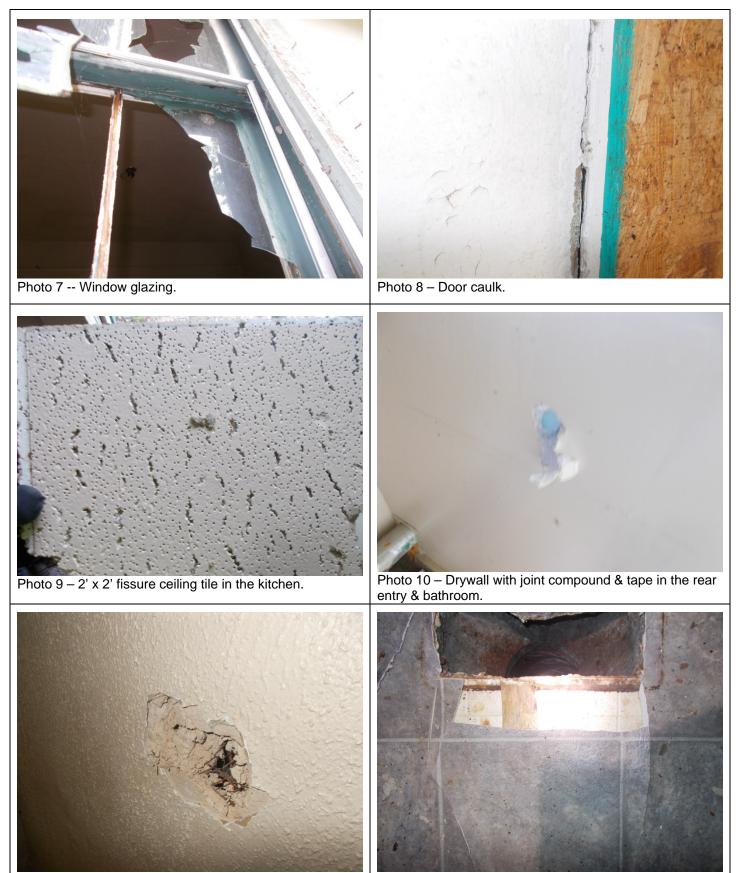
Texture over plaster with finish throughout the ceilings and walls.
